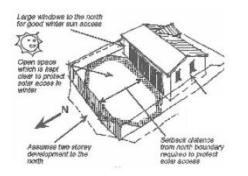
Building orientation should respond to the position of the sun and prevailing winds with larger openings facing north and larger yard space to the north.
